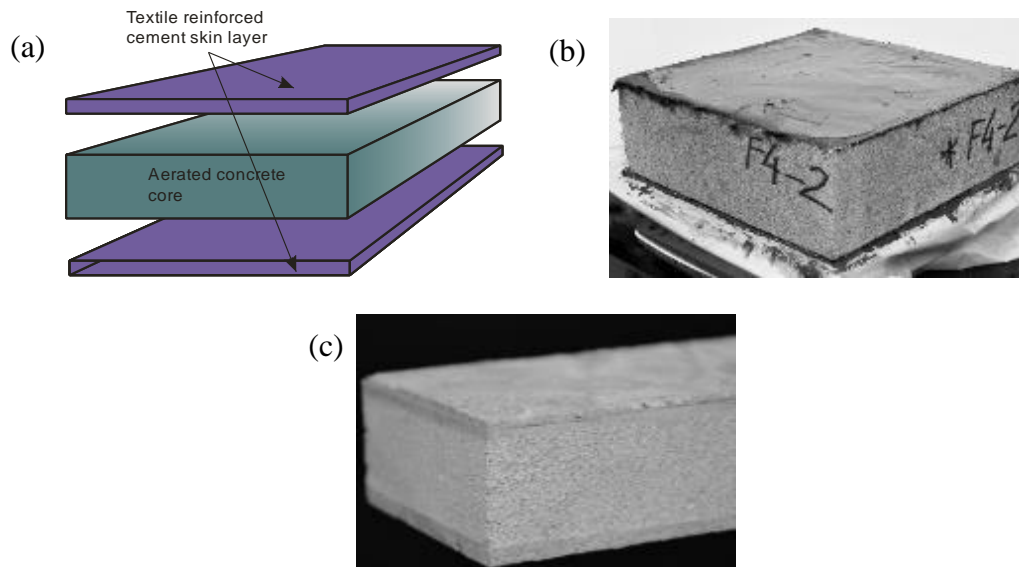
(a) Schematics of the proposed textile reinforced-aerated concrete sandwich composite system, (b) finished sandwich panel, (c) beam test coupon harvested from panel.
